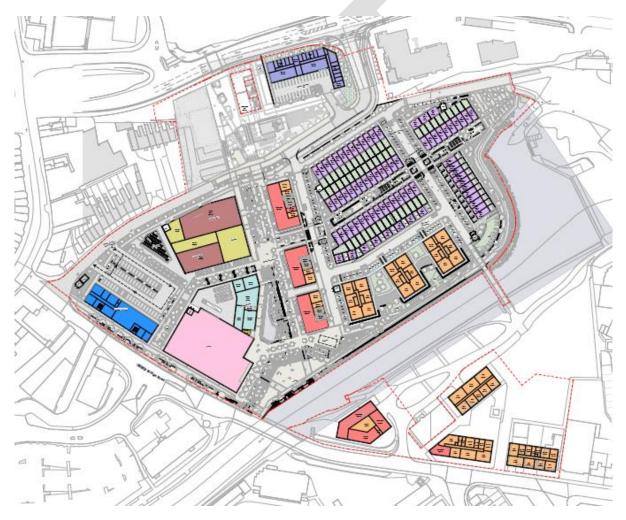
Emerging Firepool Proposals Draft Masterplan (Ground Floor Layout)
